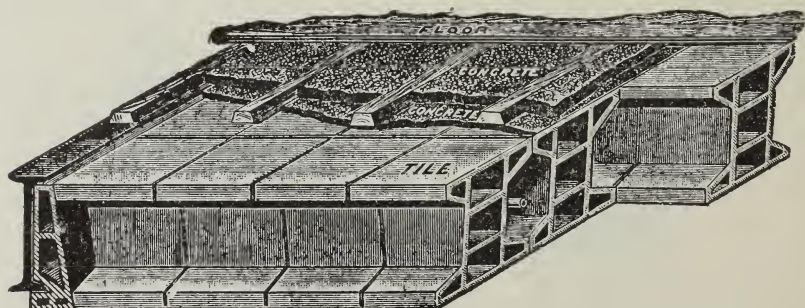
End-construction, I-beam Shape. Side-construction Skew.
